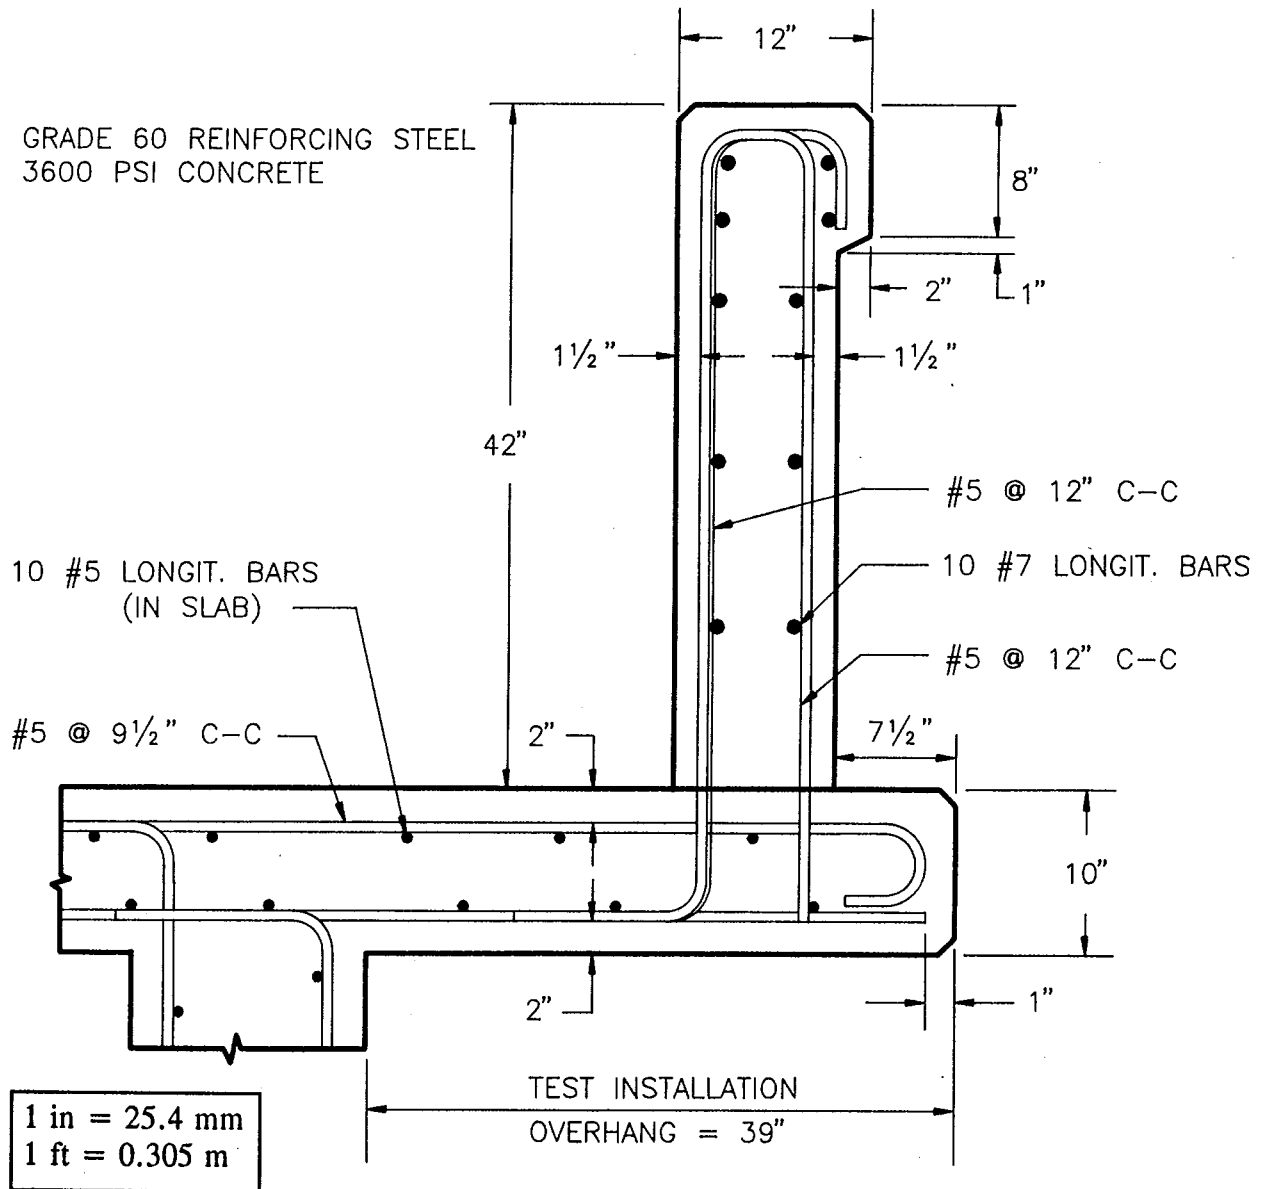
42-in (1.07-m) Vertical Concrete Parapet (8,64,65,15).
